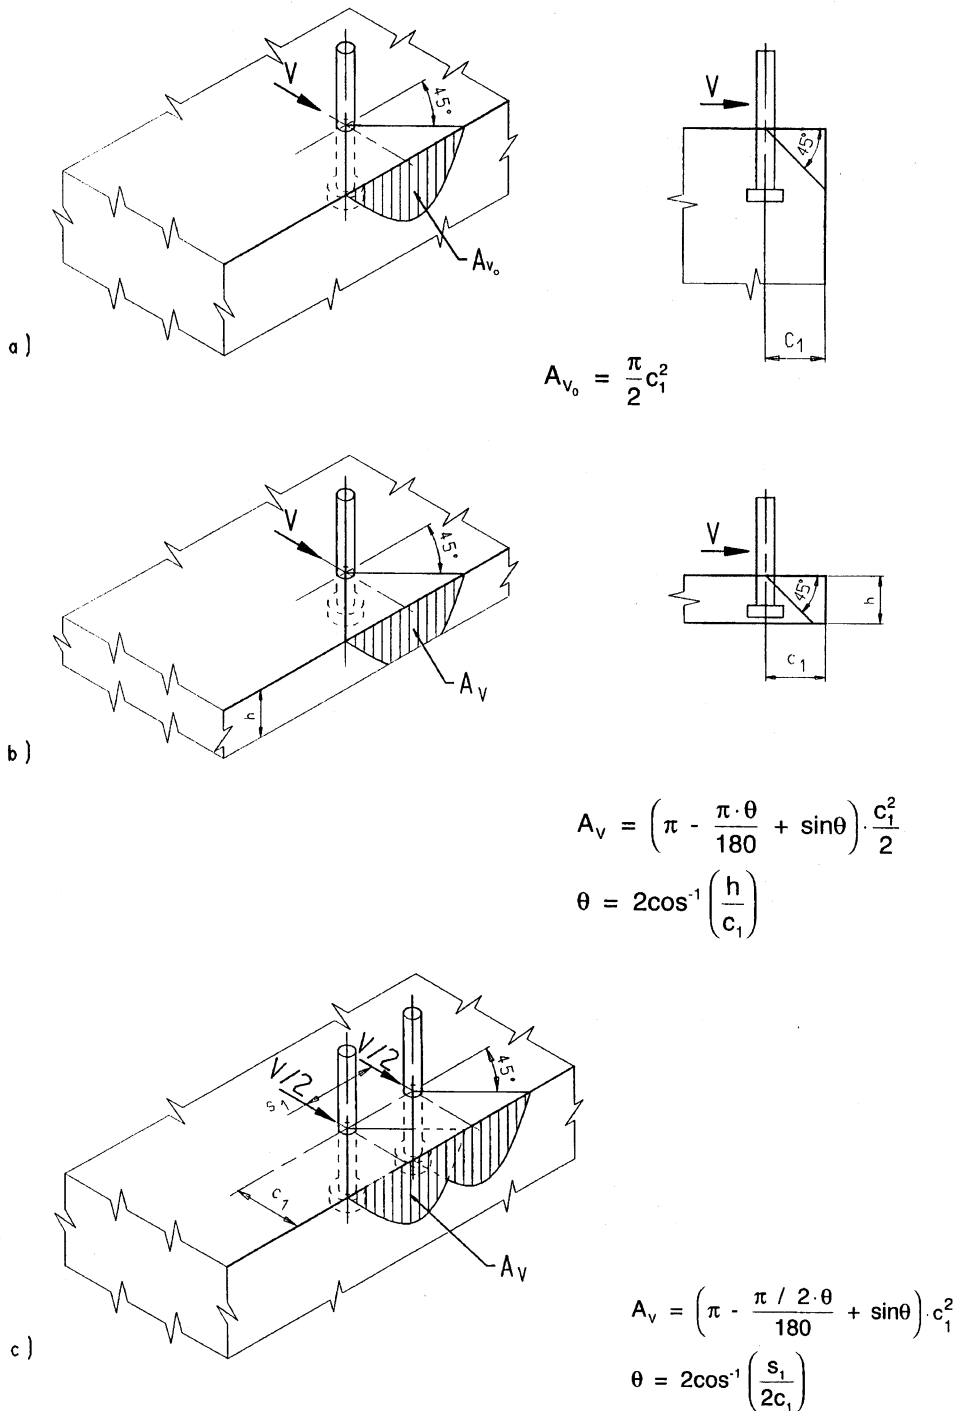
Projected areas for fastenings under shear loading according to ACI 349: (a) single fastening installed in thick concrete member; (b) single fastening installed in thin concrete member ( $h \leq c_1$ ); (c) double fastening installed in thick concrete member ( $s_1 < 2c_1$ )
